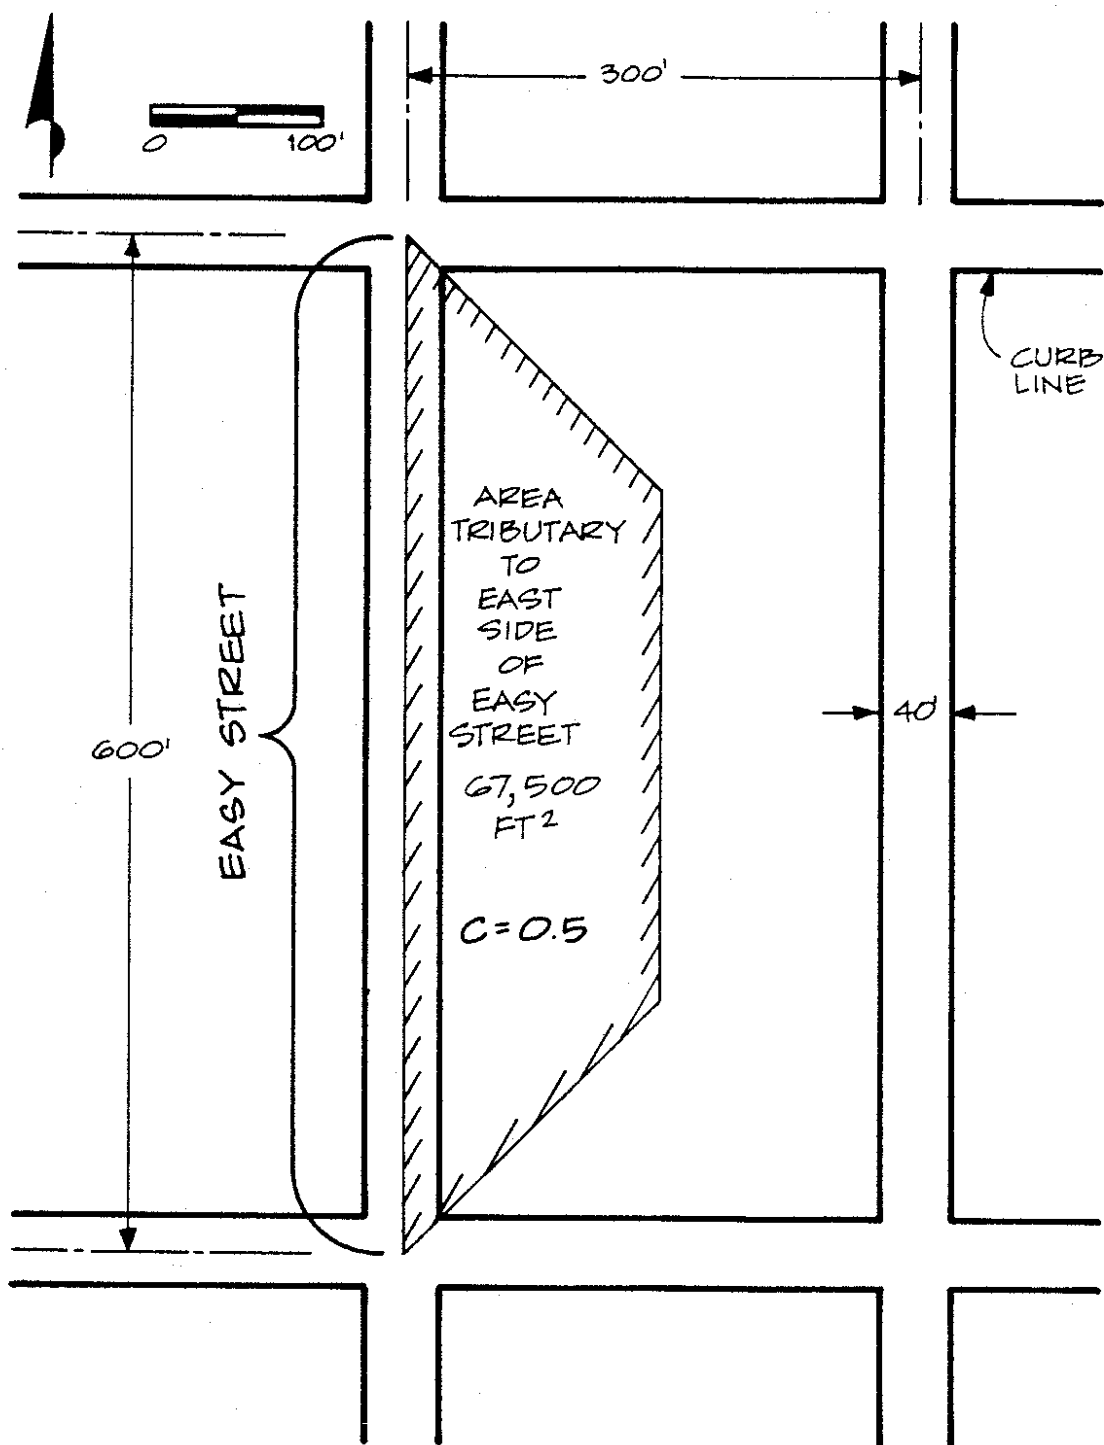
Typical urban street plan showing the area tributary to the east side of a one block segment of Easy Street (Source: Walesh, 1989, p. 193).
